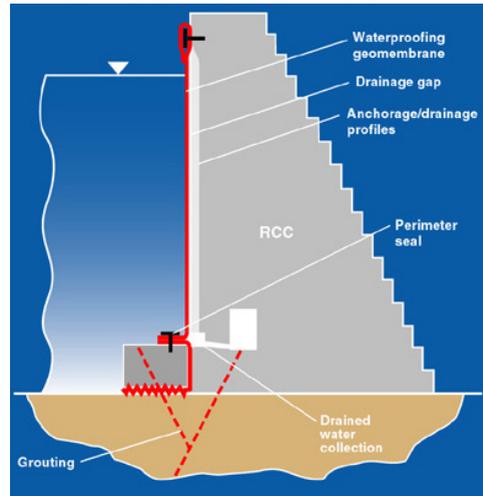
Concept of the exposed geomembrane system in RCC dams.
